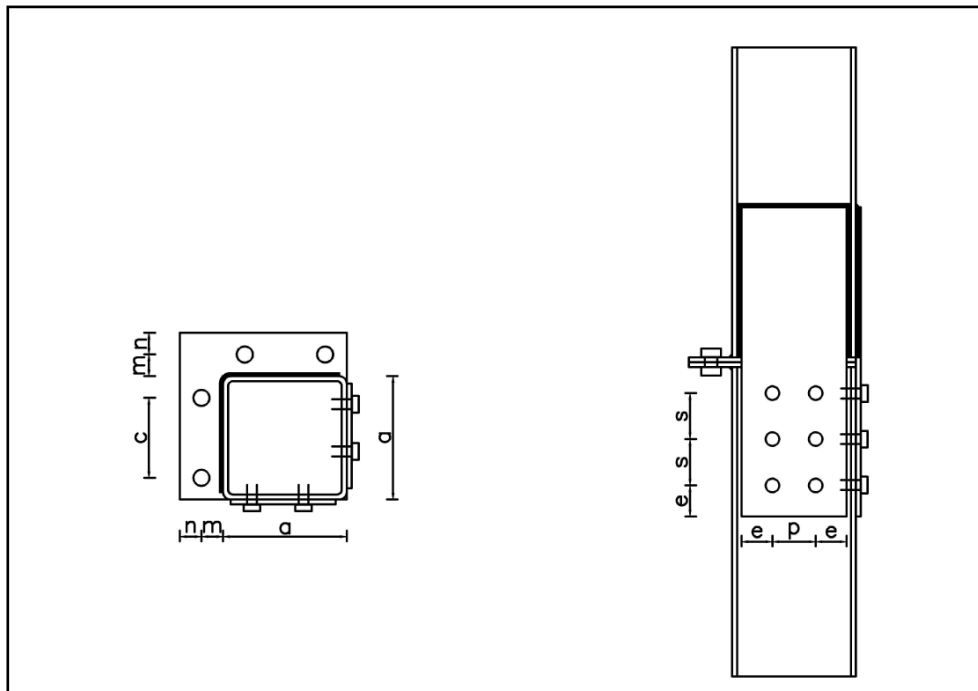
Plan and elevation of non-symmetrical corner splice connection
